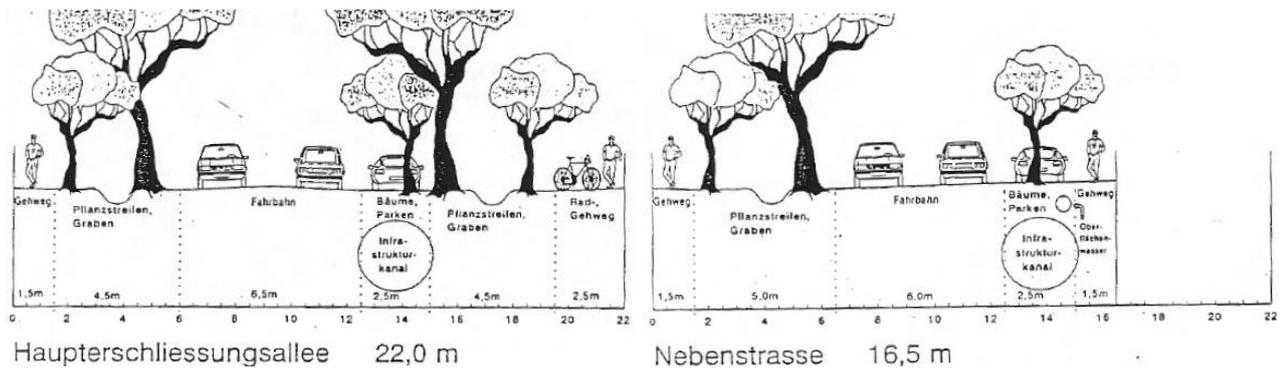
standard road grid cross sections for main boulevards and side roads of the urban business/industrial development area
